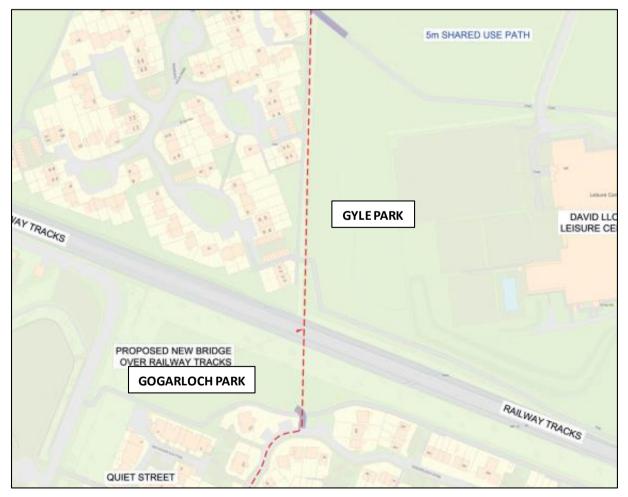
Proposed bridge linking Gyle Park to Gogarloch Park
